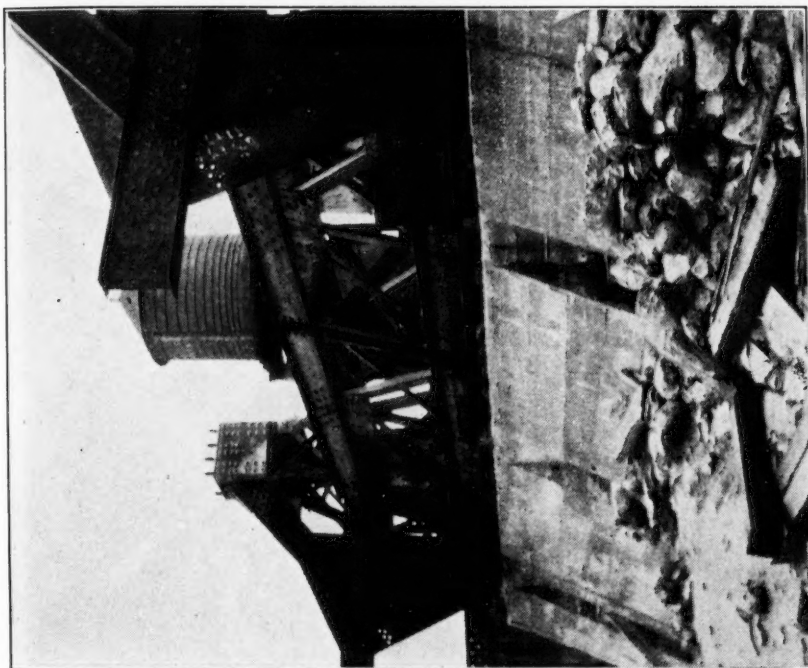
VIEW SHOWING CONNECTION OF LONGITUDINAL AND TRANSVERSE TRUSSES, ON SPECIAL PIERS.
